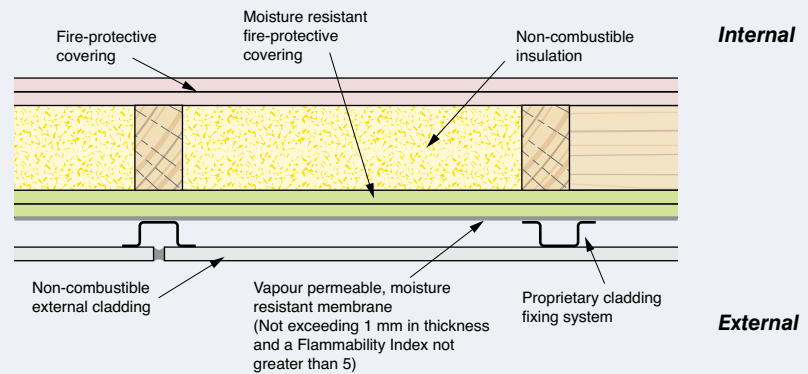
Fire-protected timber frame external walls with lightweight cladding.
